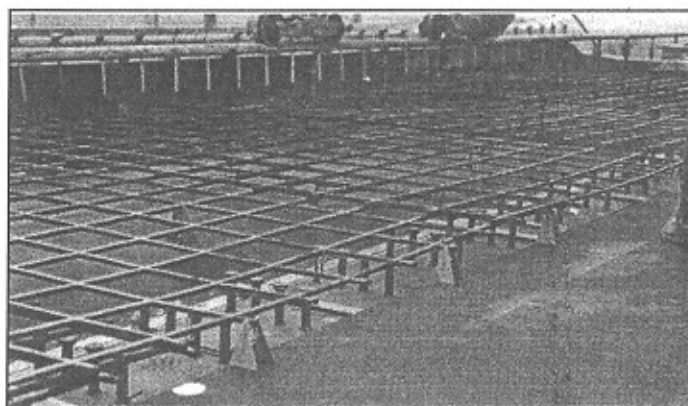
NEFMAC for the overhang slabs of a bridge deck slab.
